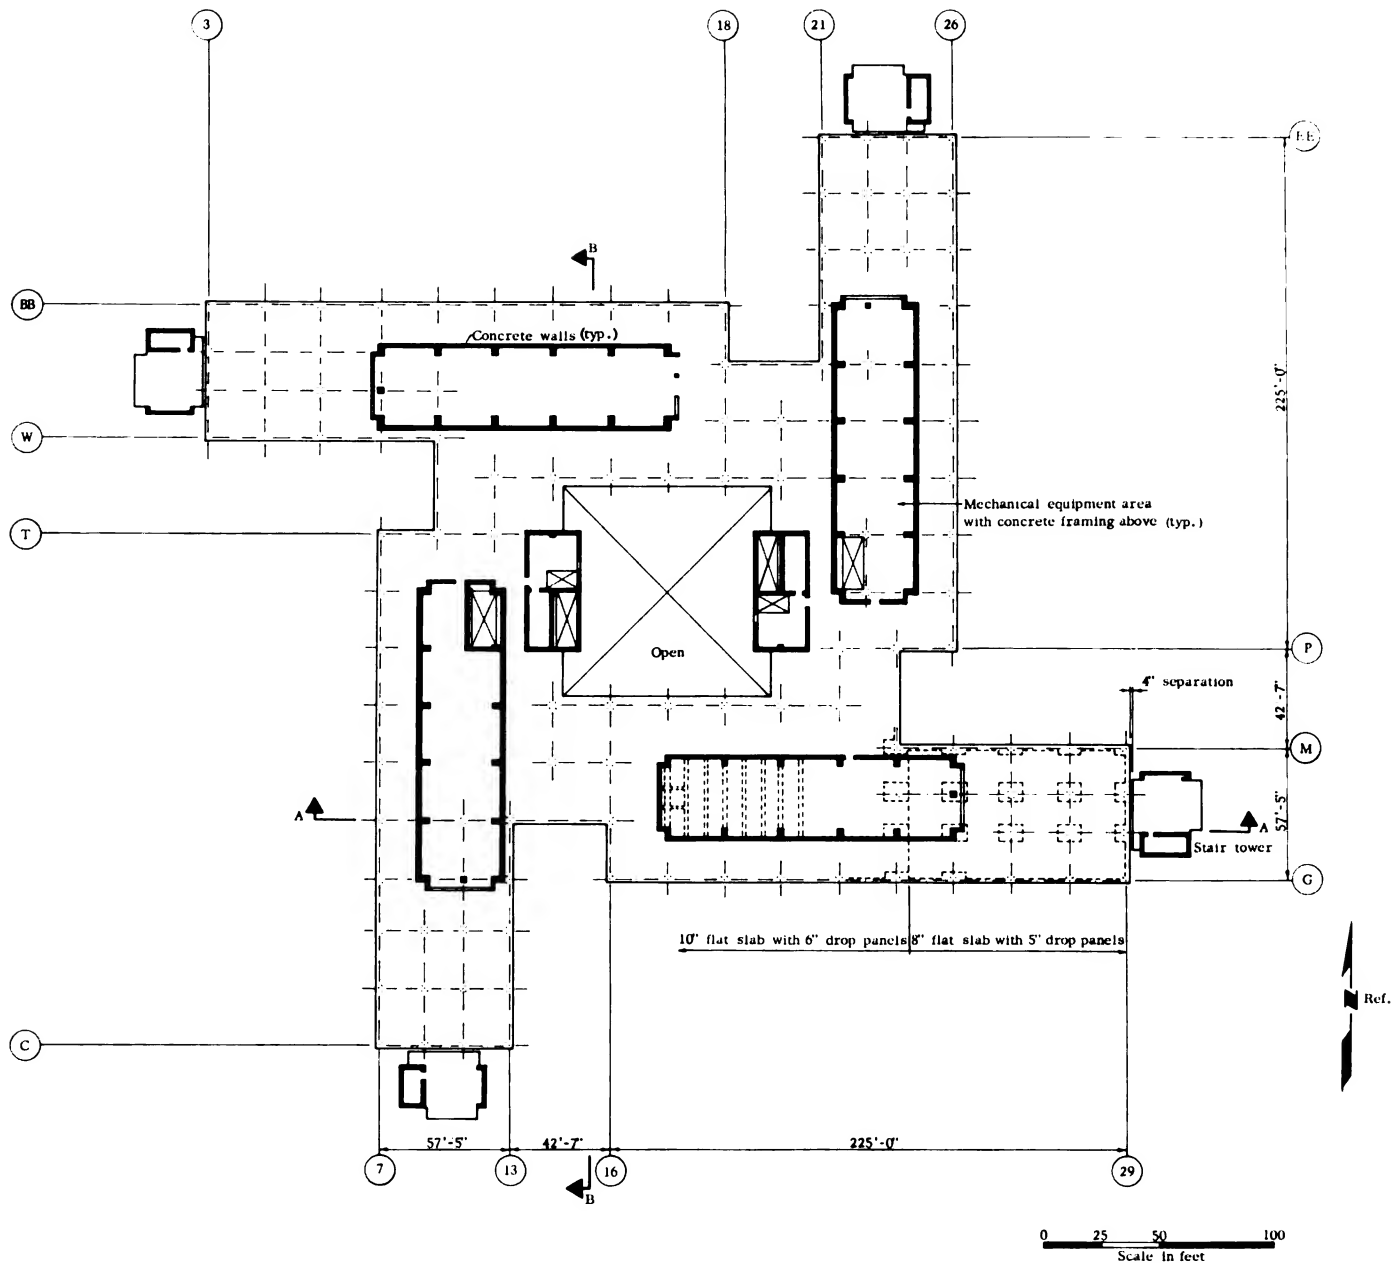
Olive View Hospital, medical treatment and care unit. Roof framing plan.
